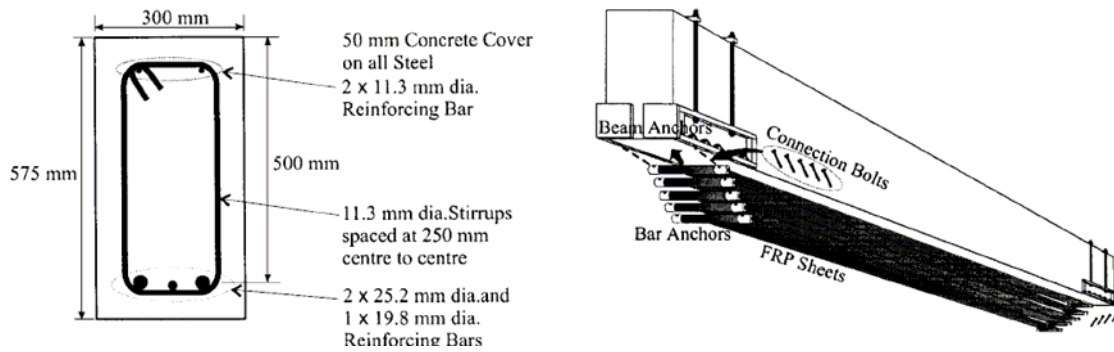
Mechanical anchorage system and cross-section of the beam (Wight et al. 2001).
